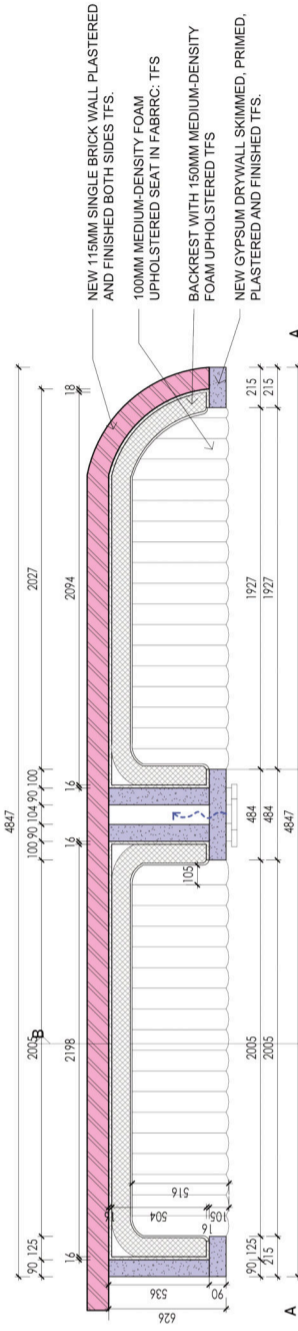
B | 1:15 WALL COVE LIGHT ON WRAPPING SEATING
